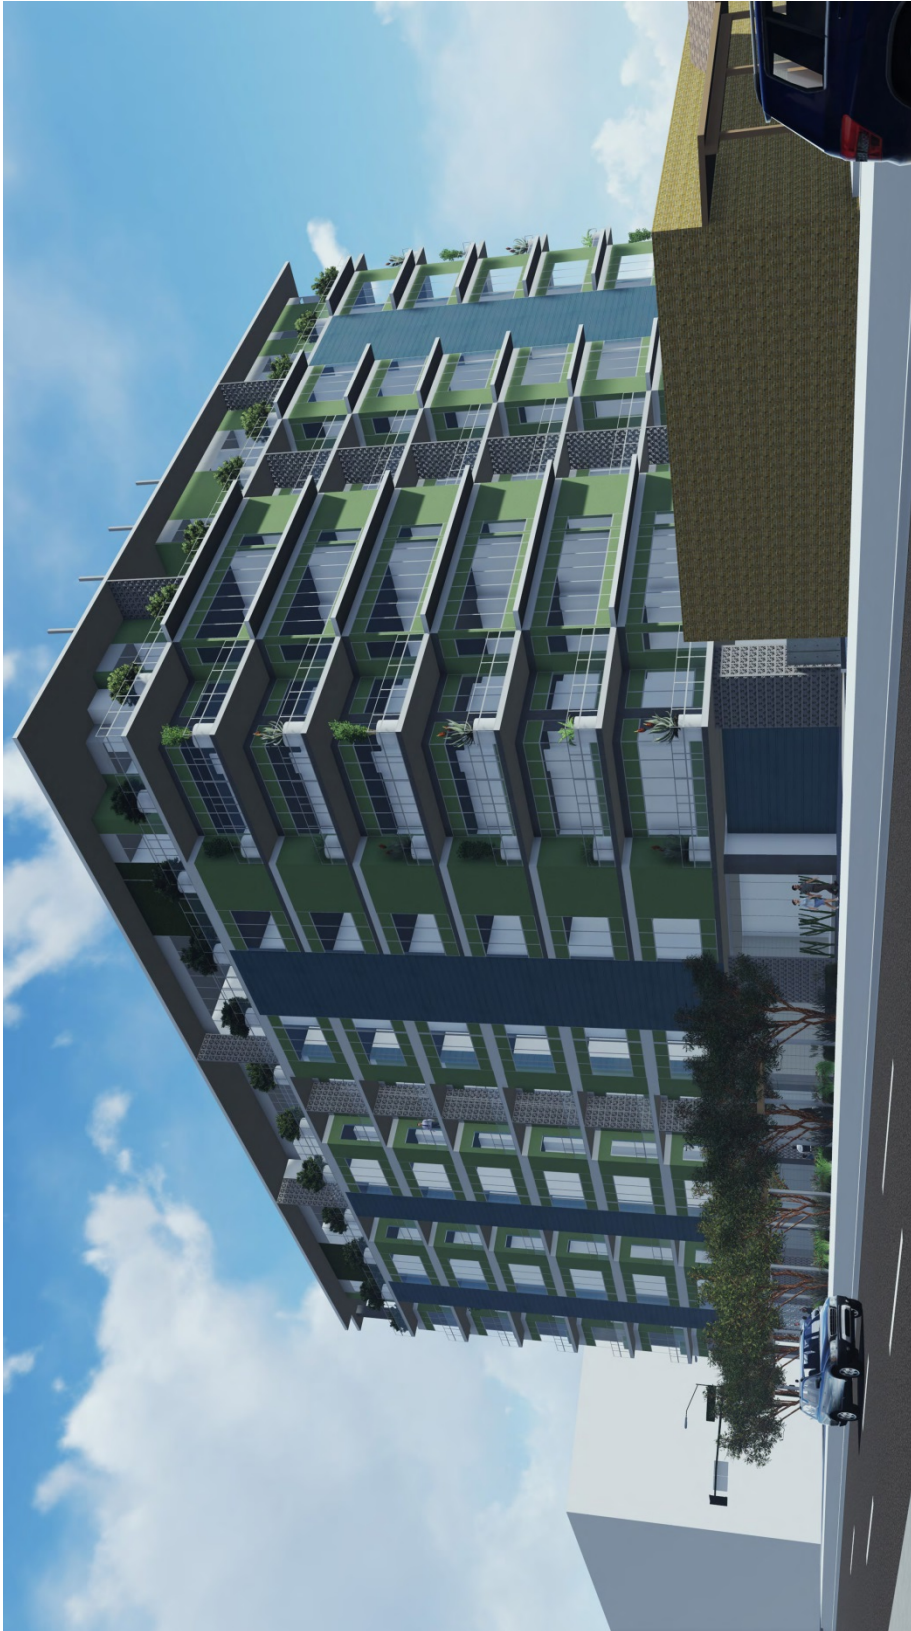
Conceptual Perspective Views - Northeast Corner
